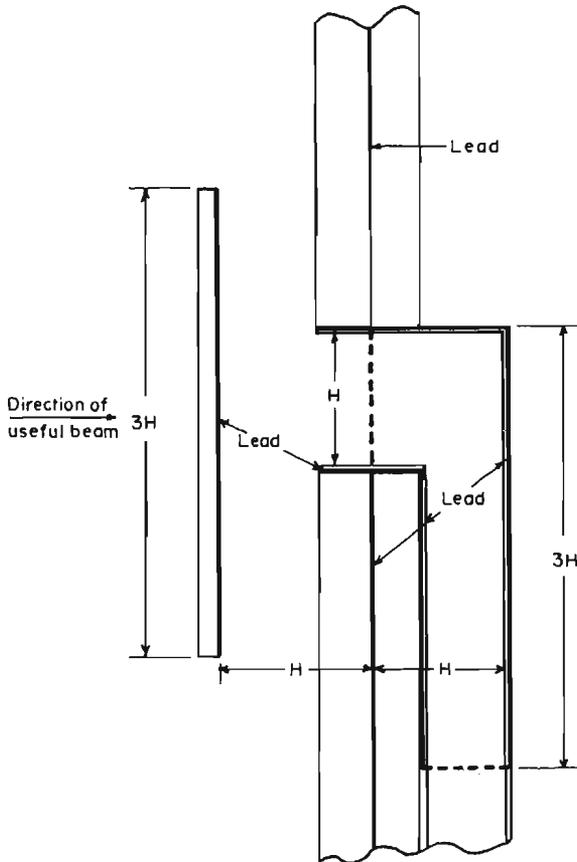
Typical baffle design for openings in primary protective barrier for orthovoltage installations.
